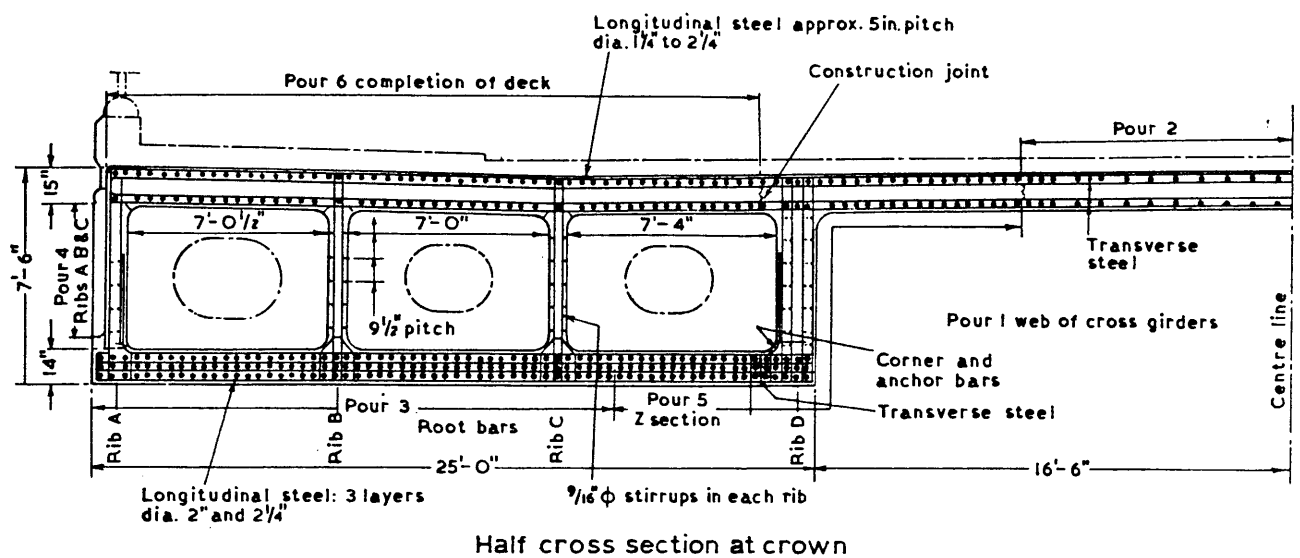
Half section through the crown of the Waterloo Bridge, London, showing the triple box girders (ref. 4)
